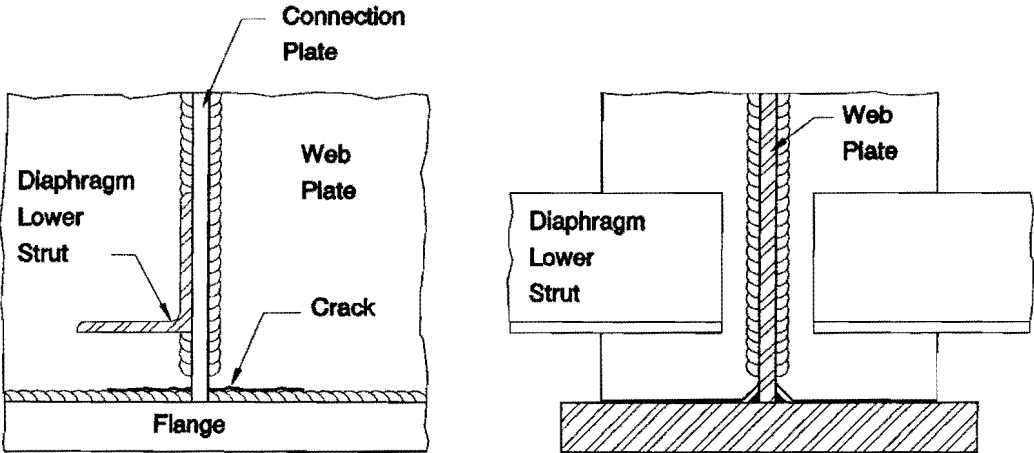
Type A1 fatigue cracking in tight-fit detail.
